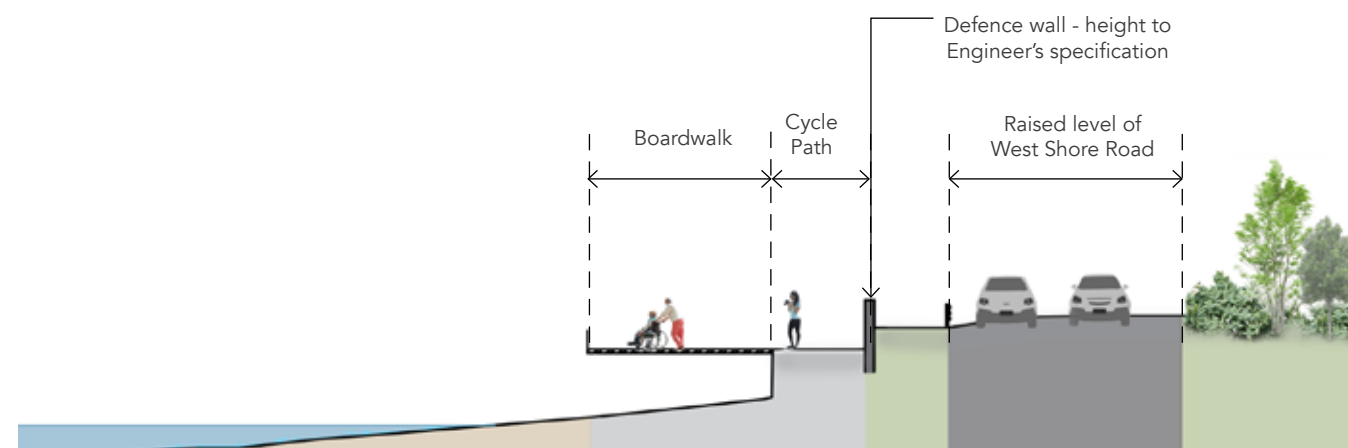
Section B-B through cantilevered walkway, diagram by LUC
